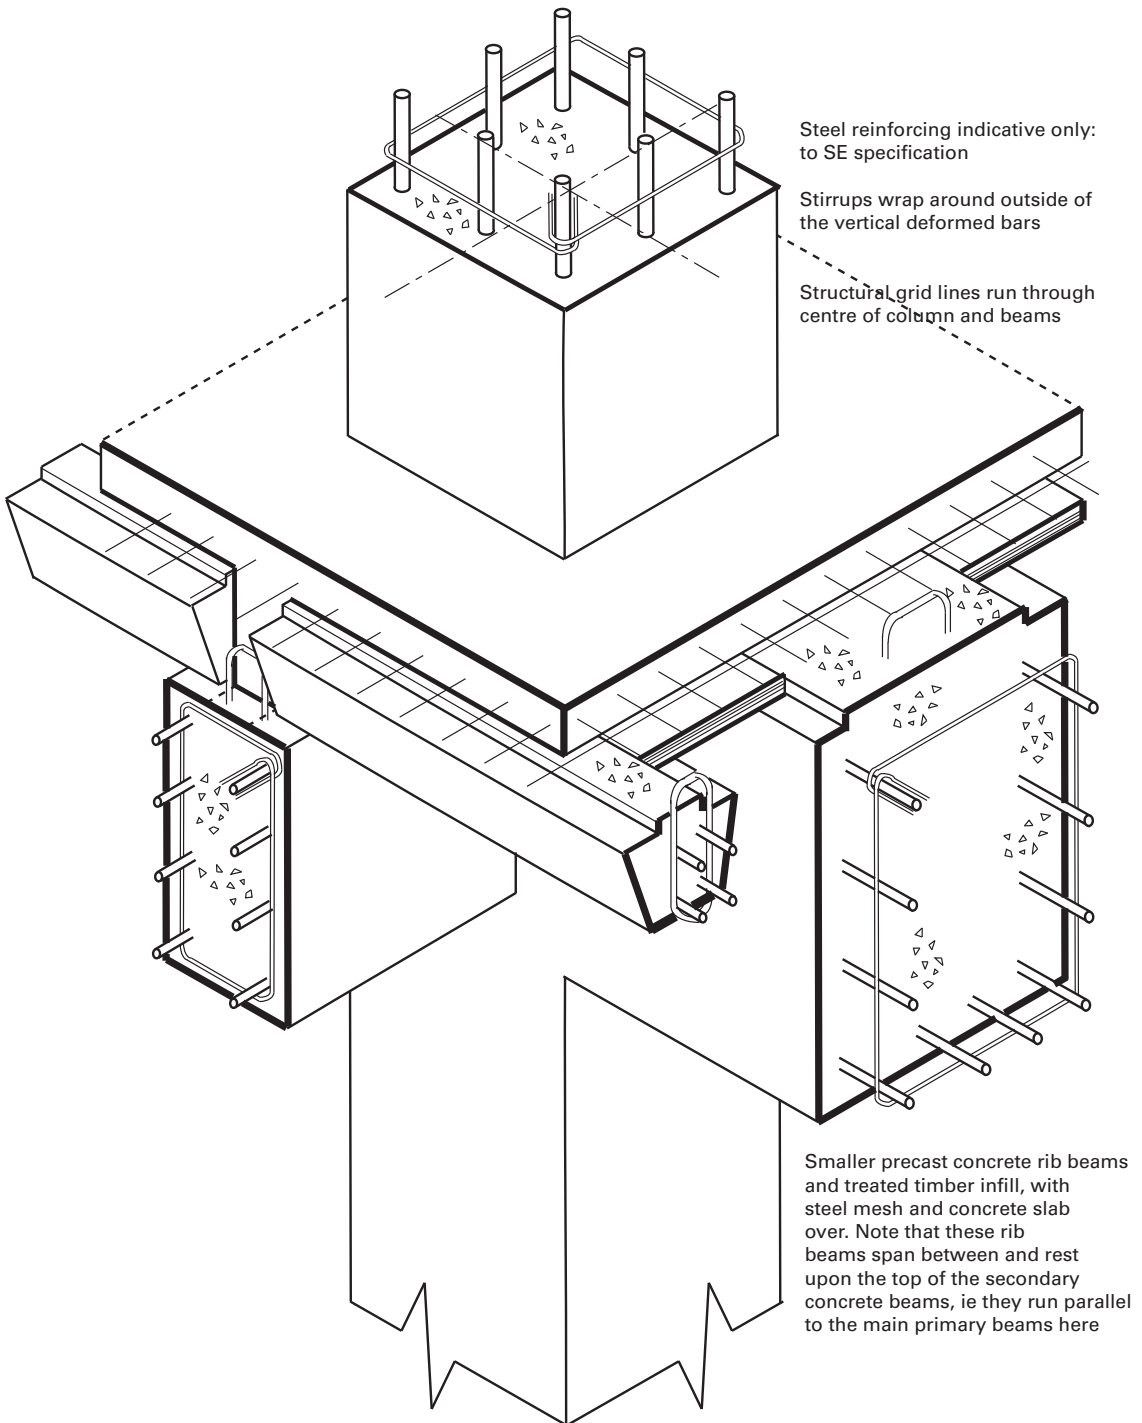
Typical concrete column/beam junction with rib beams and timber infill
